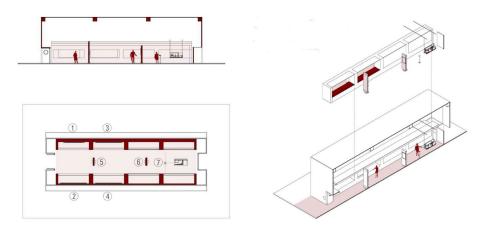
Gino Valle's room. Plan, section and axonometric cross-section.
